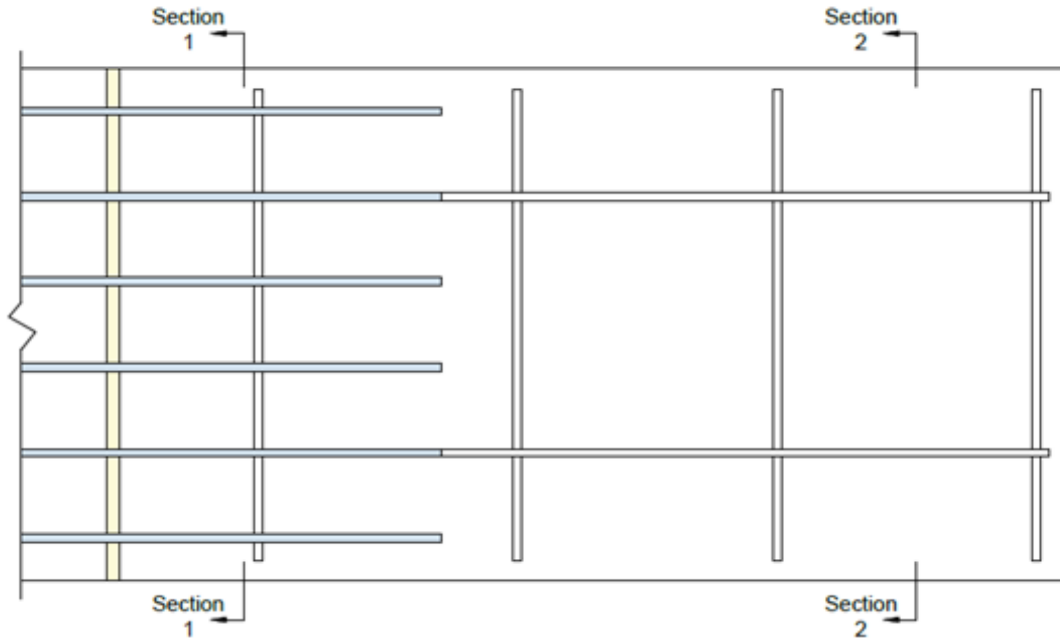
Section 1 and Section 2 as labelled for the design of reinforcement in the cantilevered reinforced concrete balcony slab
